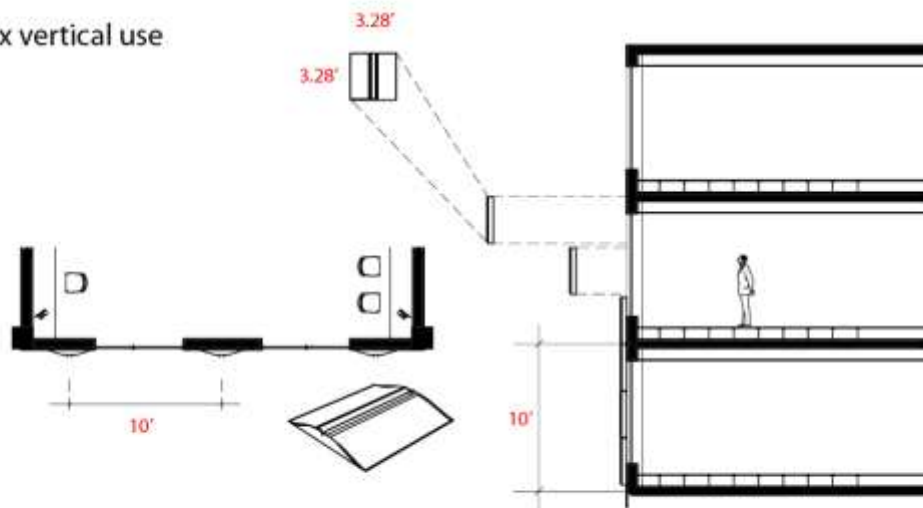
A schematic of a building with the wind turbine surface design integrated onto the side.
